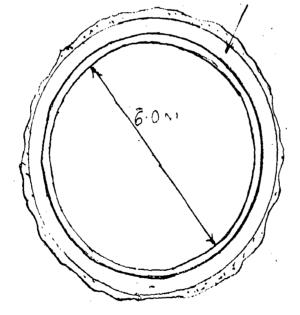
STEEL RIB SUPPORTS ADOPTED IN KHARA PROJECT TUNNELS
